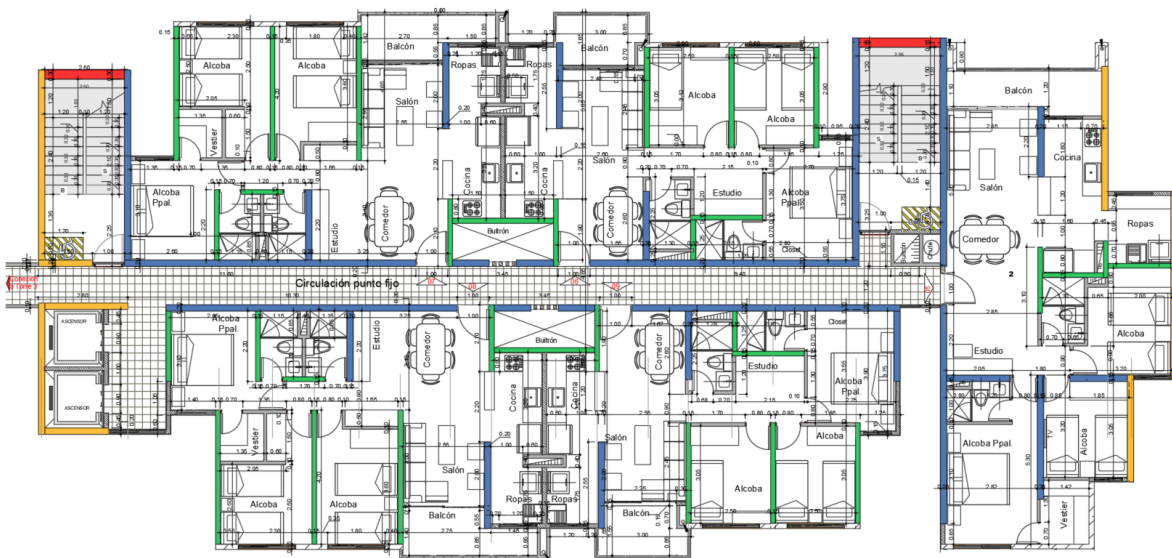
Typical Distributions of RCWB with Asymmetrical Floor Plans.
